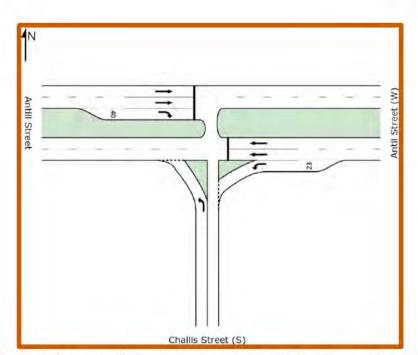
Recommended Layout for the Intersection of Antill Street and Challis Street
